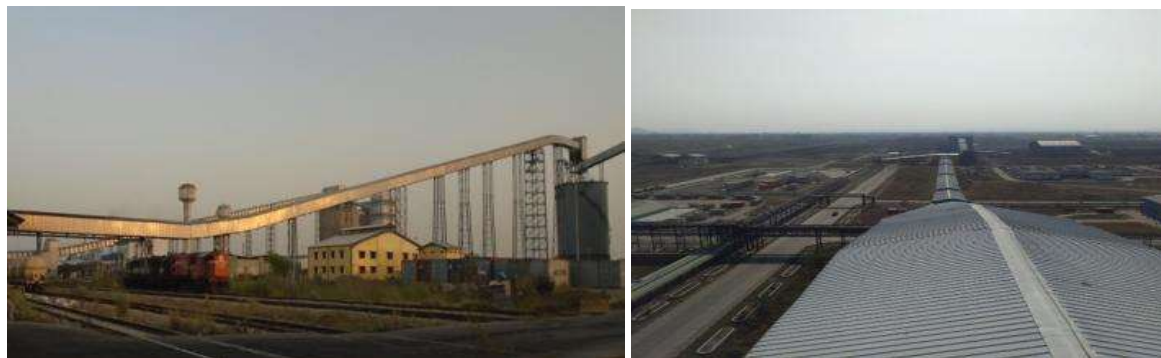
Conveyor belt For Alumina & Pet Coke Handling and Coal respectively
